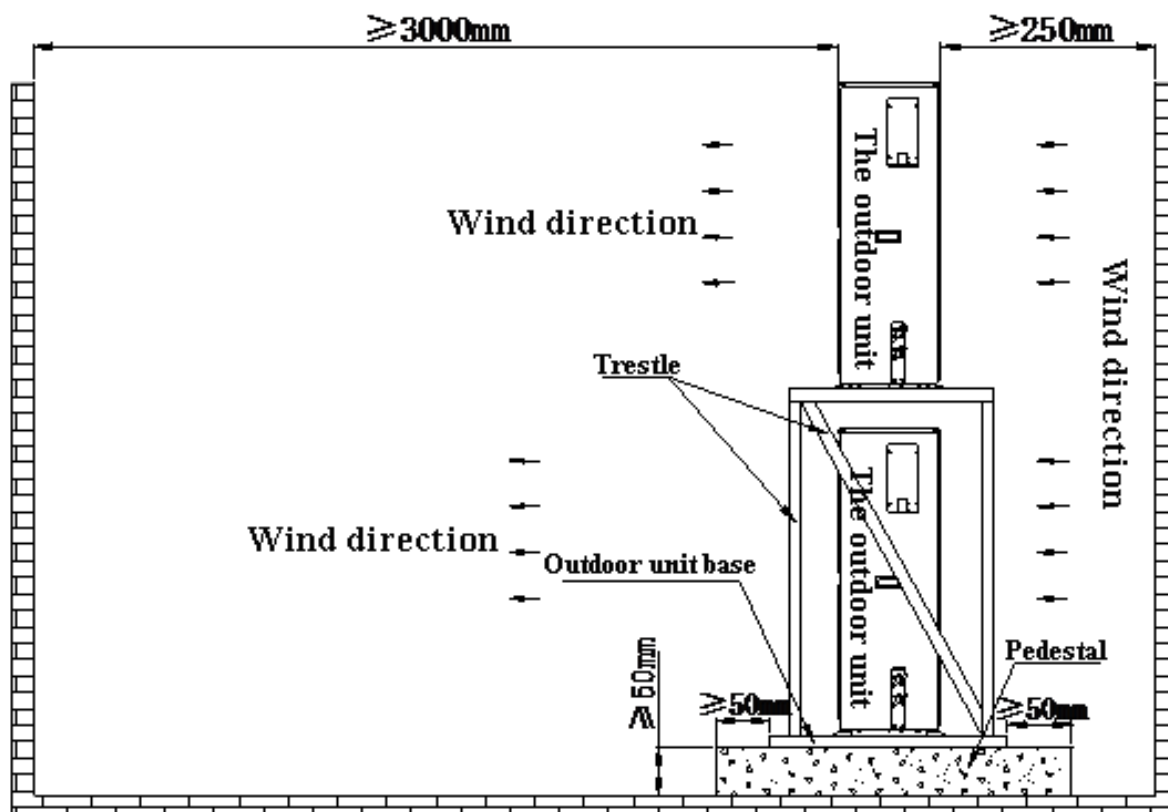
Schematic diagram of overlapping placement and installation of VCP005 outdoor unit
